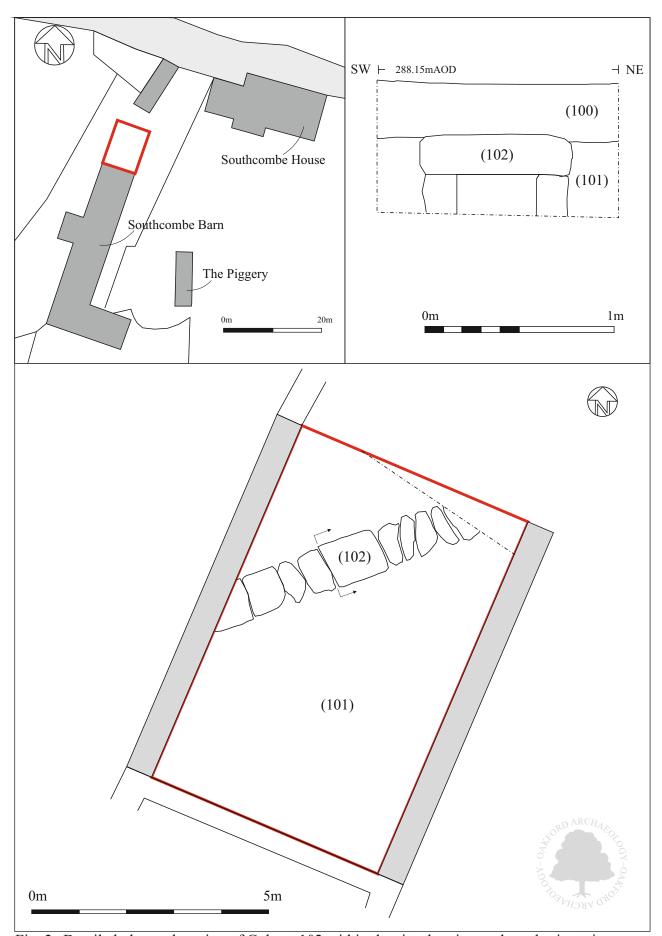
Detailed plan and section of Culvert 102 within the site showing scale and orientation.
